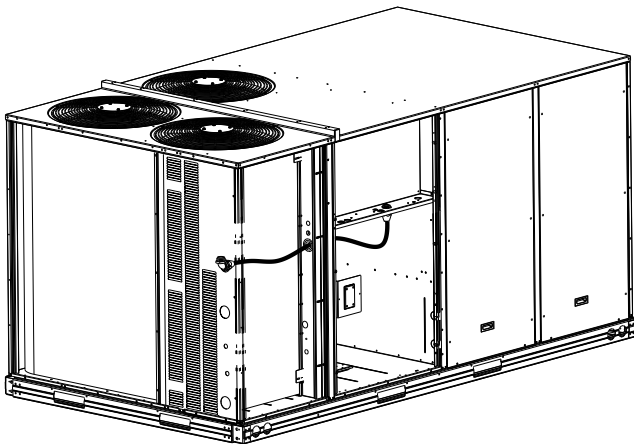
In either case, set the disconnect vertical location on the unit so that a 90° fitting can be used to connect the conduit to the disconnect.
